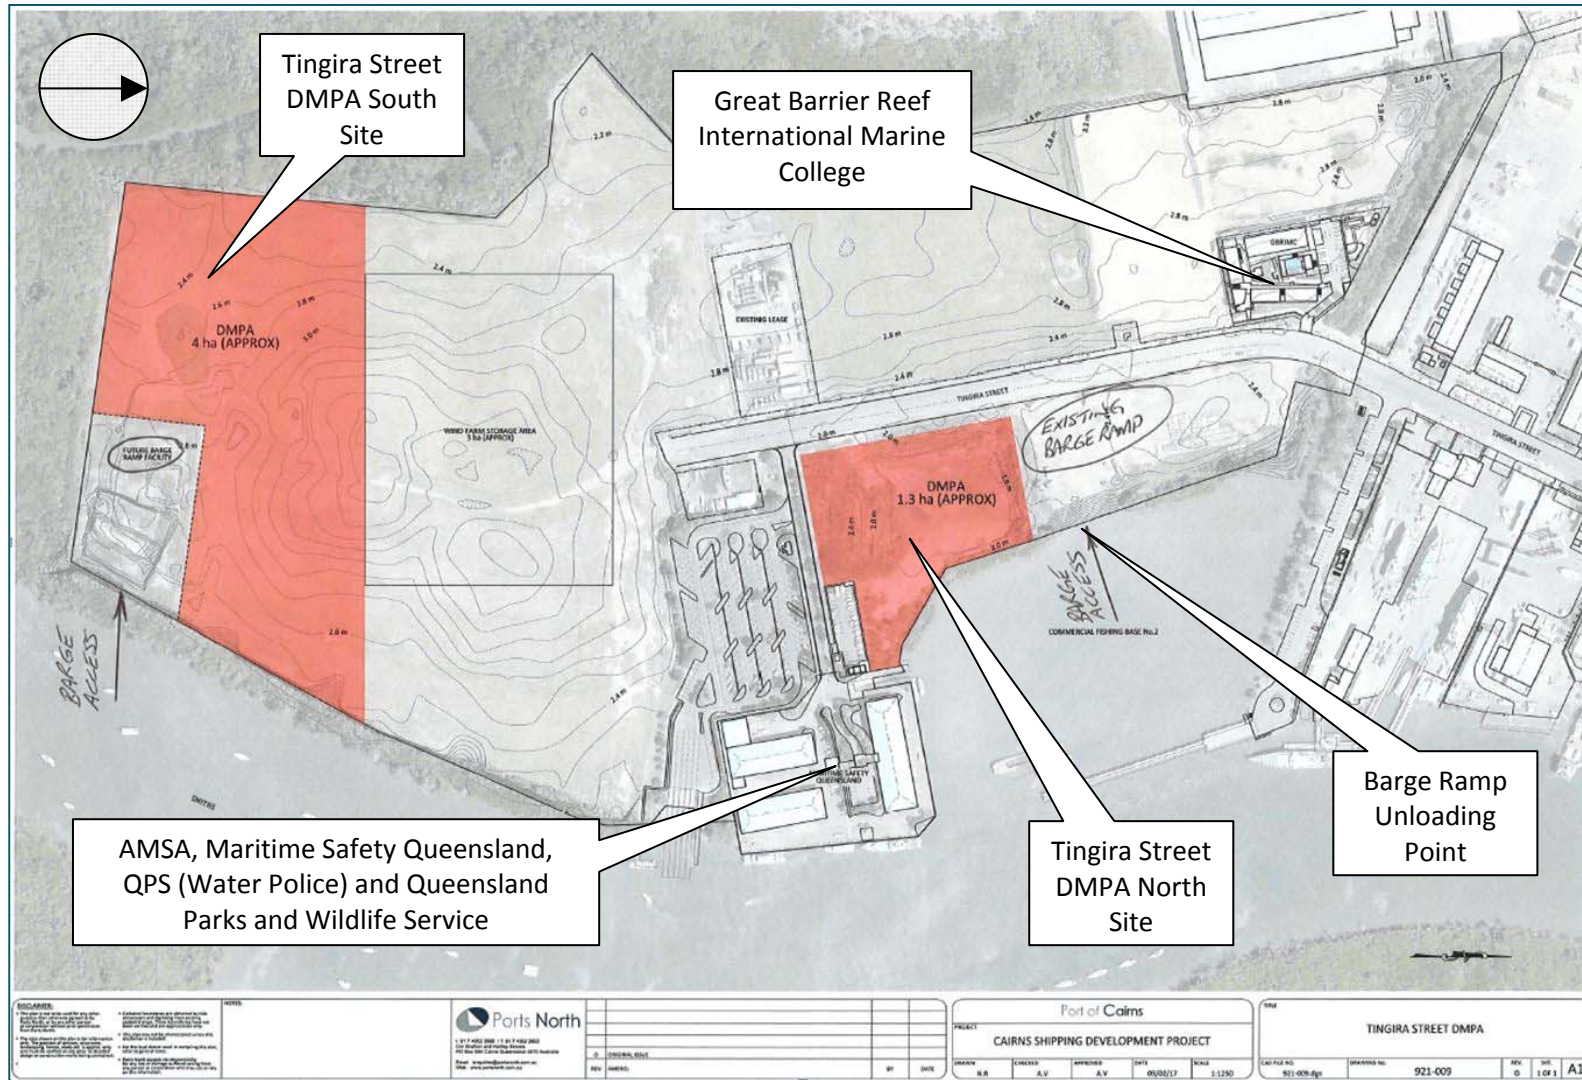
Plan of Tingira Street DMPA Locations and Nearest Buildings
